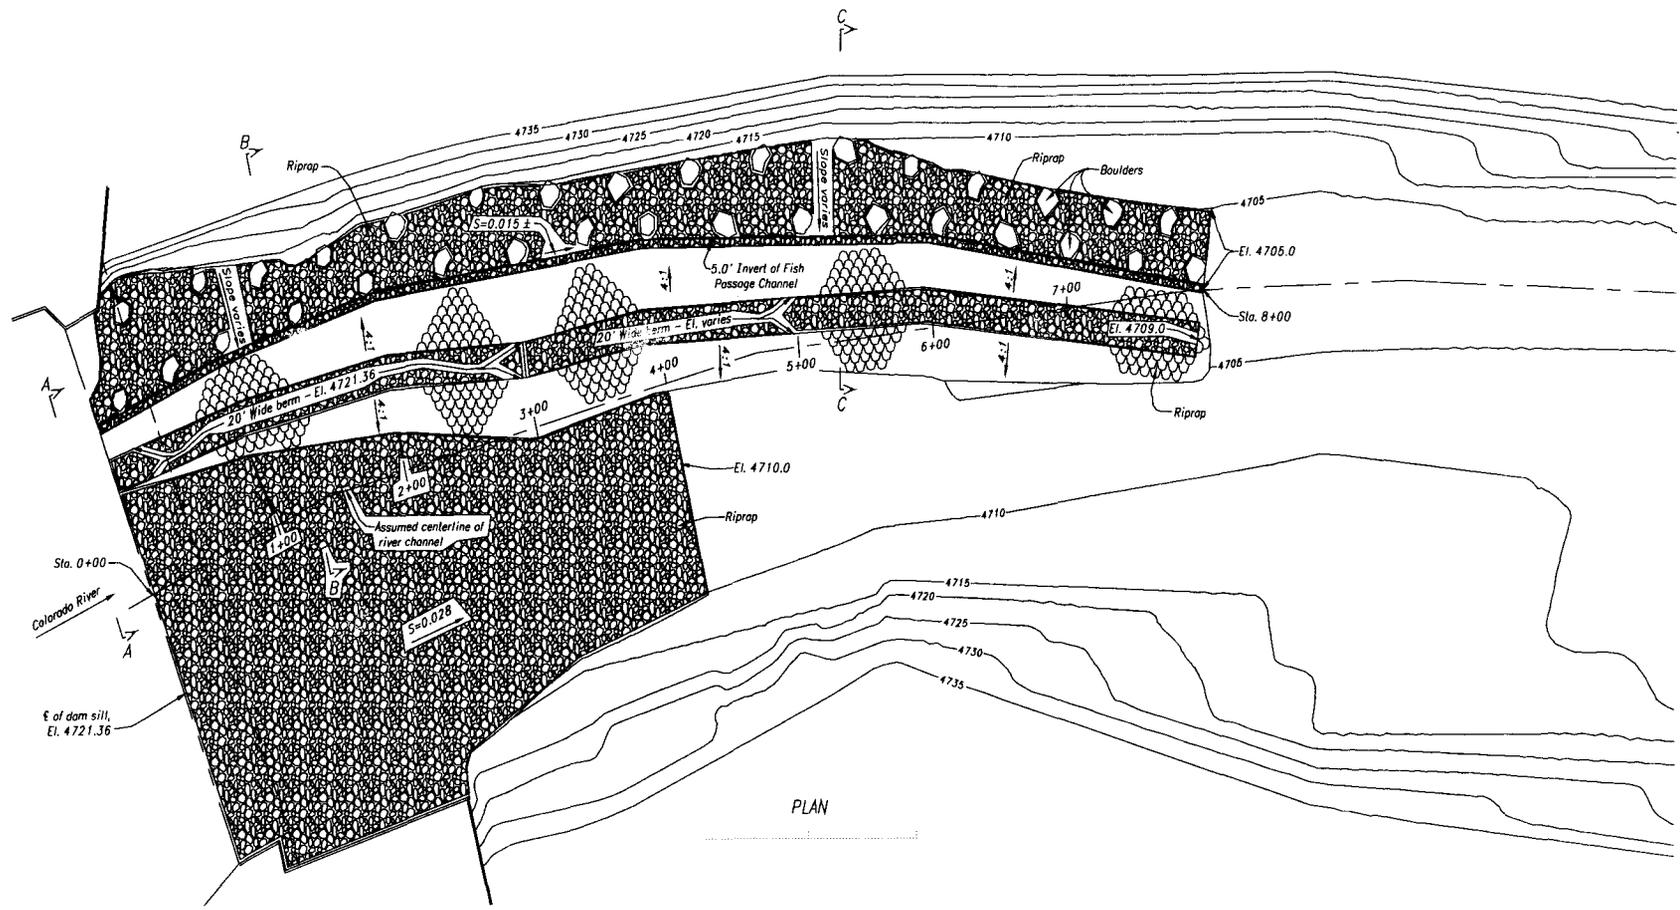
Recommended configuration (configuration 3) plan view conceptual layout.
